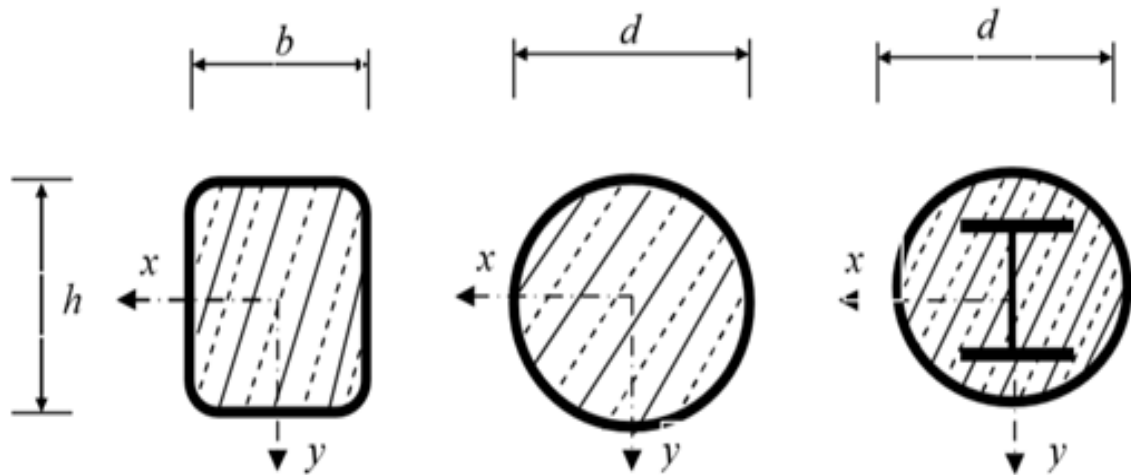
Typical cross-sections of fully and partially concrete encased columns
